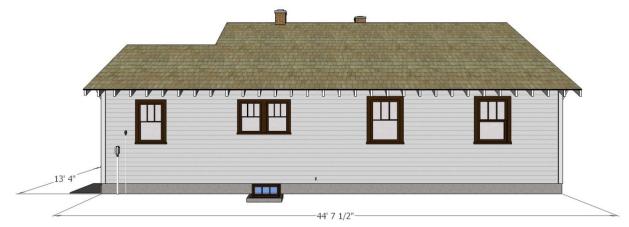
Measured drawing of east elevation of Ranger Dwelling.
